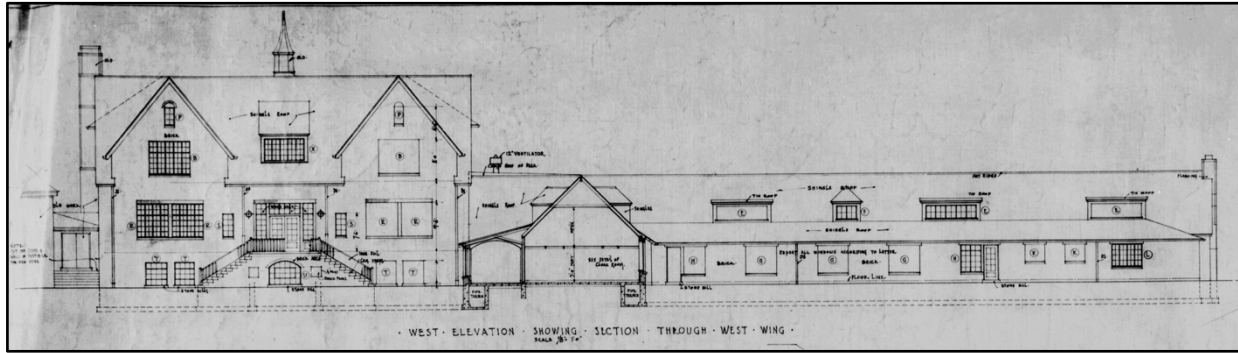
Original Pond & Pond Plans - West Elevation. From Ryerson and Burnham Art and Architecture Archives.
